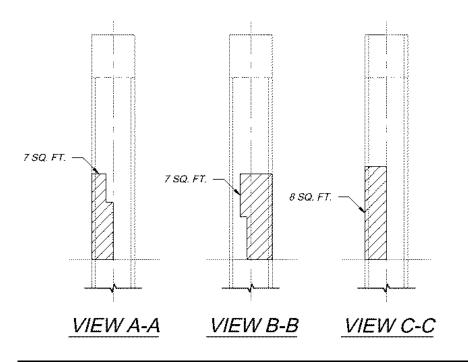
Location of Proposed Concrete Repairs - Pier 3 View A-A - View C-C MP 182.1
